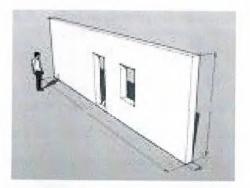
A wall (architecture.about.com/buildingparts/wall)
